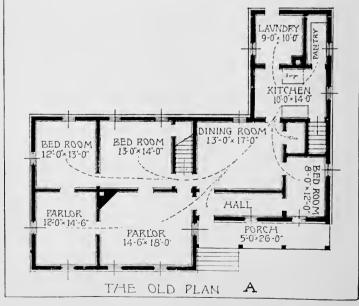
A remodeled farmhouse, to illustrate step-saving,
